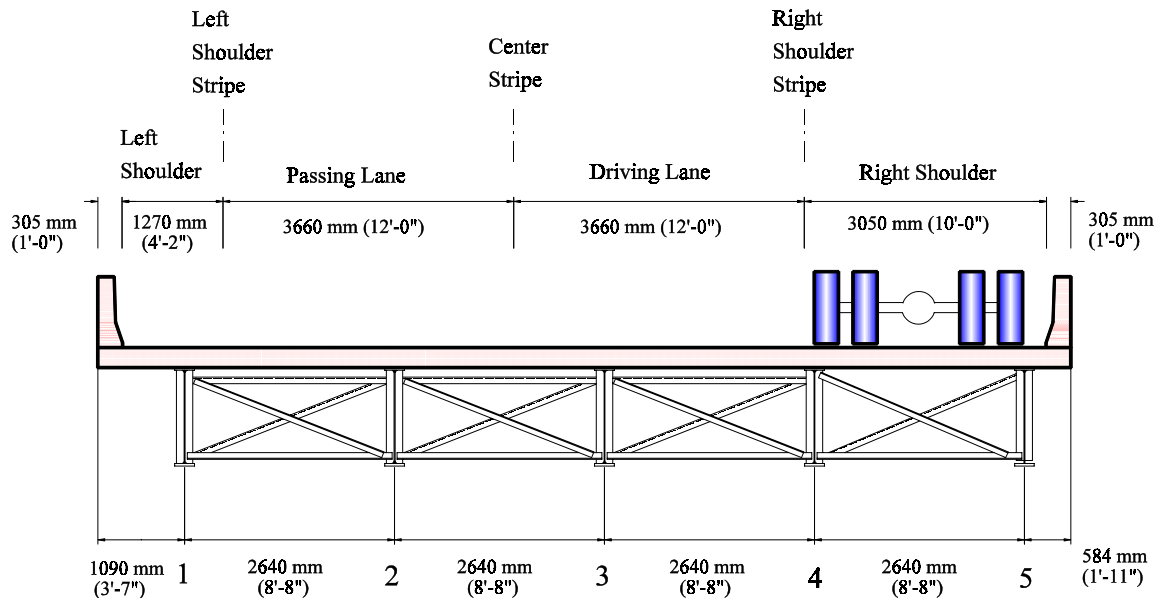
Location for test truck positioned in center of right shoulder lane (Pass No. 3).
